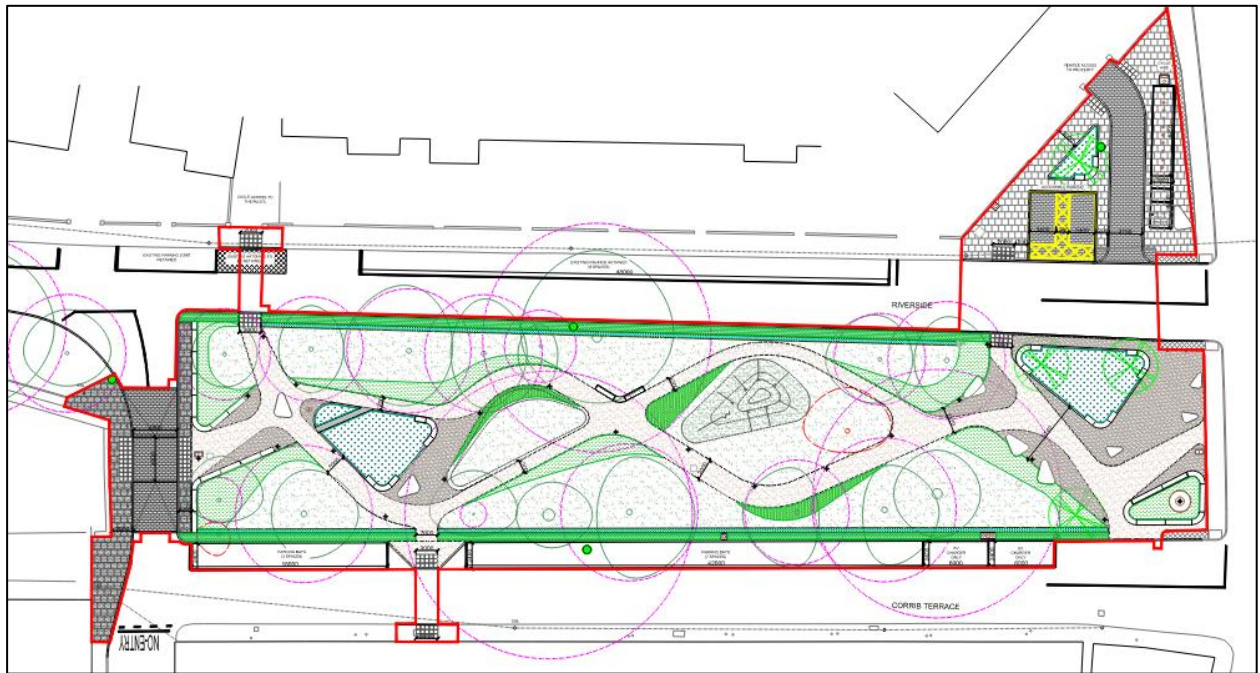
Proposed Site Layout (Ref: LUC Architects)
